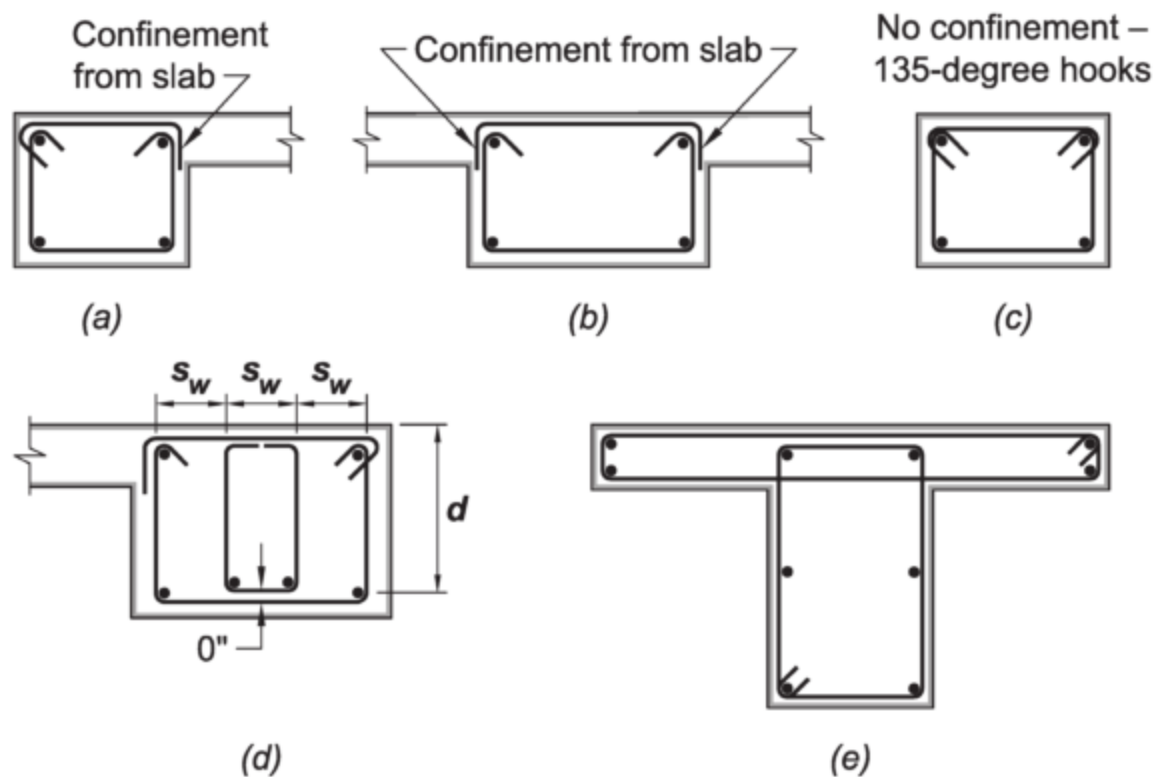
Longitudinal reinforcement distributed around beam perimeter with closed stirrups.
